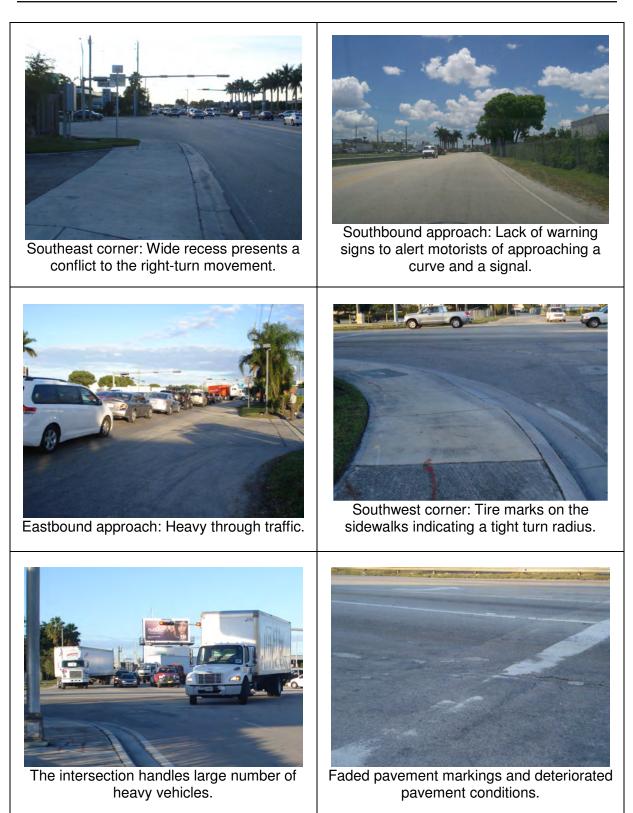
Field Review – NW 79 Avenue and NW 58 Street
